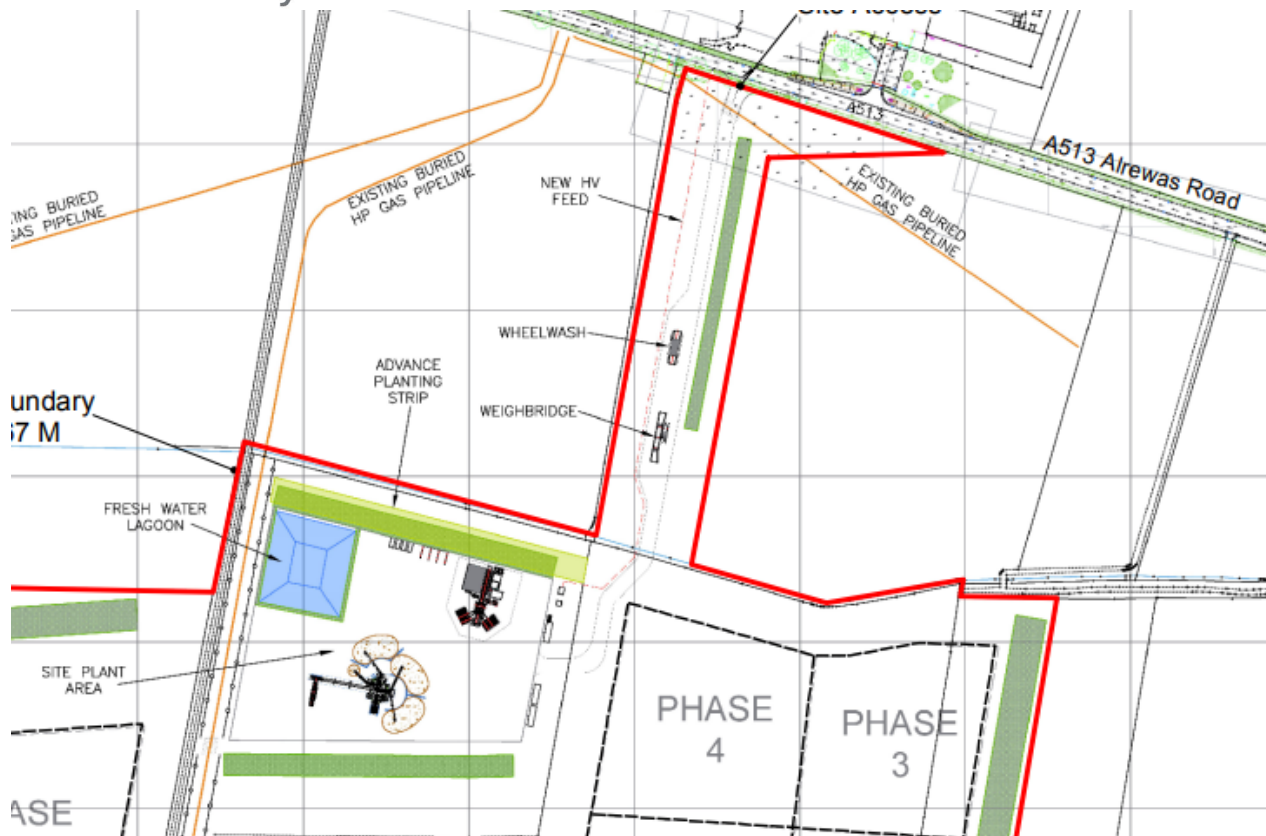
Extract from [Plan 2](#) accompanying report to Planning Committee on 15 July 2021 showing the location of the plant area including concrete plant and access onto A513.
